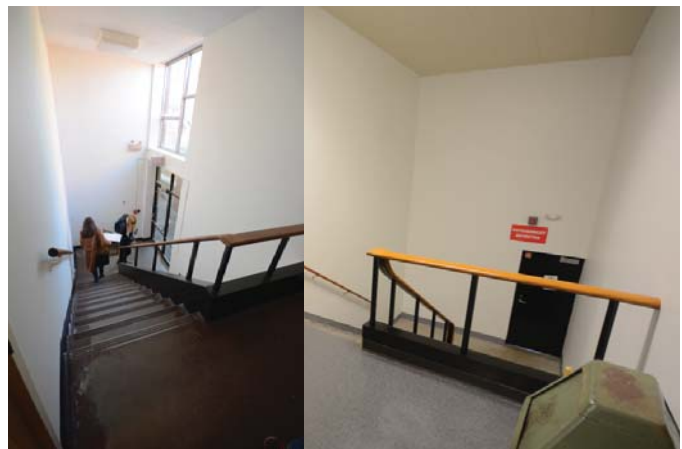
Original stairs in Old Rich (left) and the Calculator Building (right).
